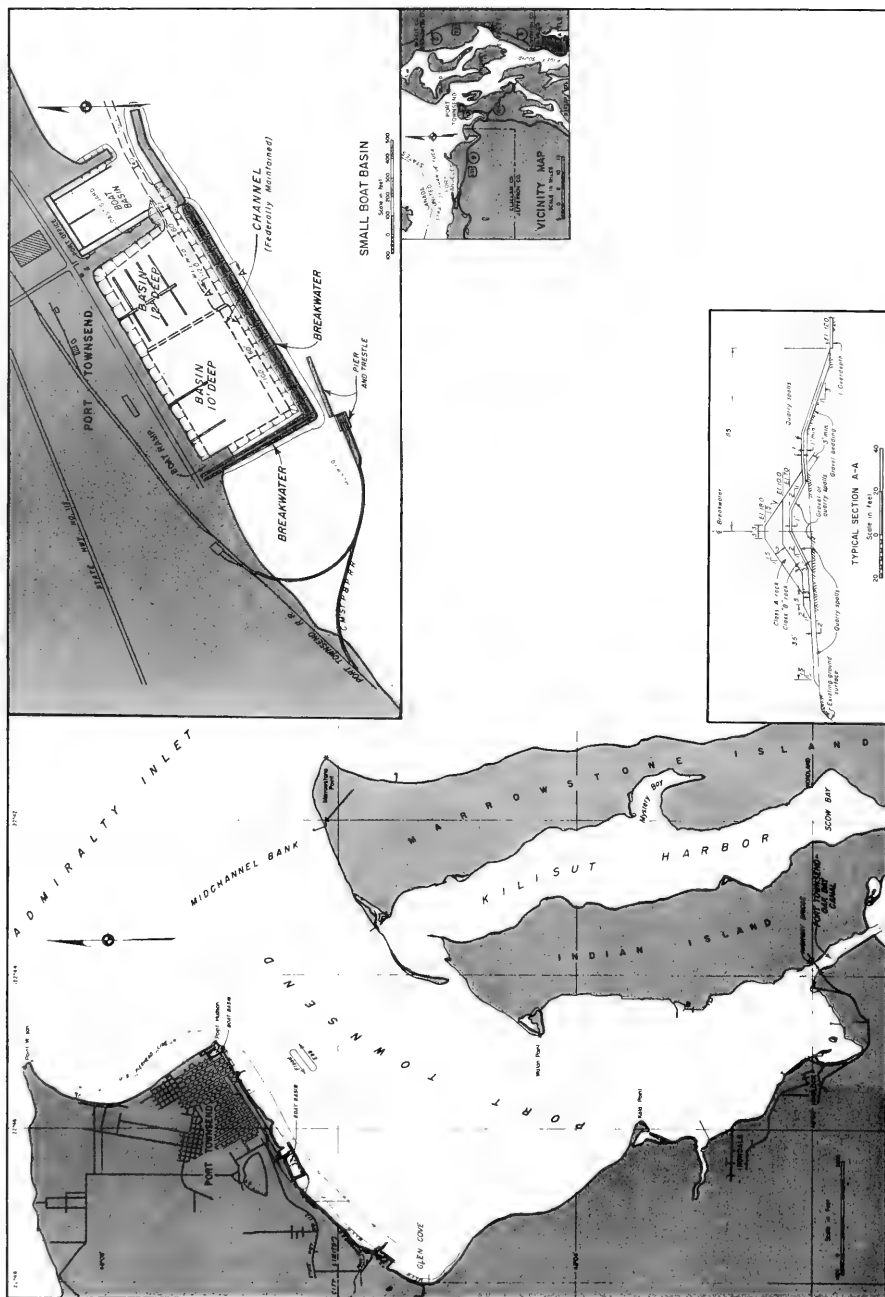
Site layout of Port Townsend, Washington (revised 1979)
